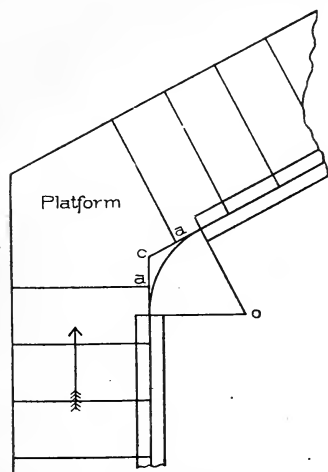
Arrangement of Risers in Stair with Obtuse-Angle Plan.
